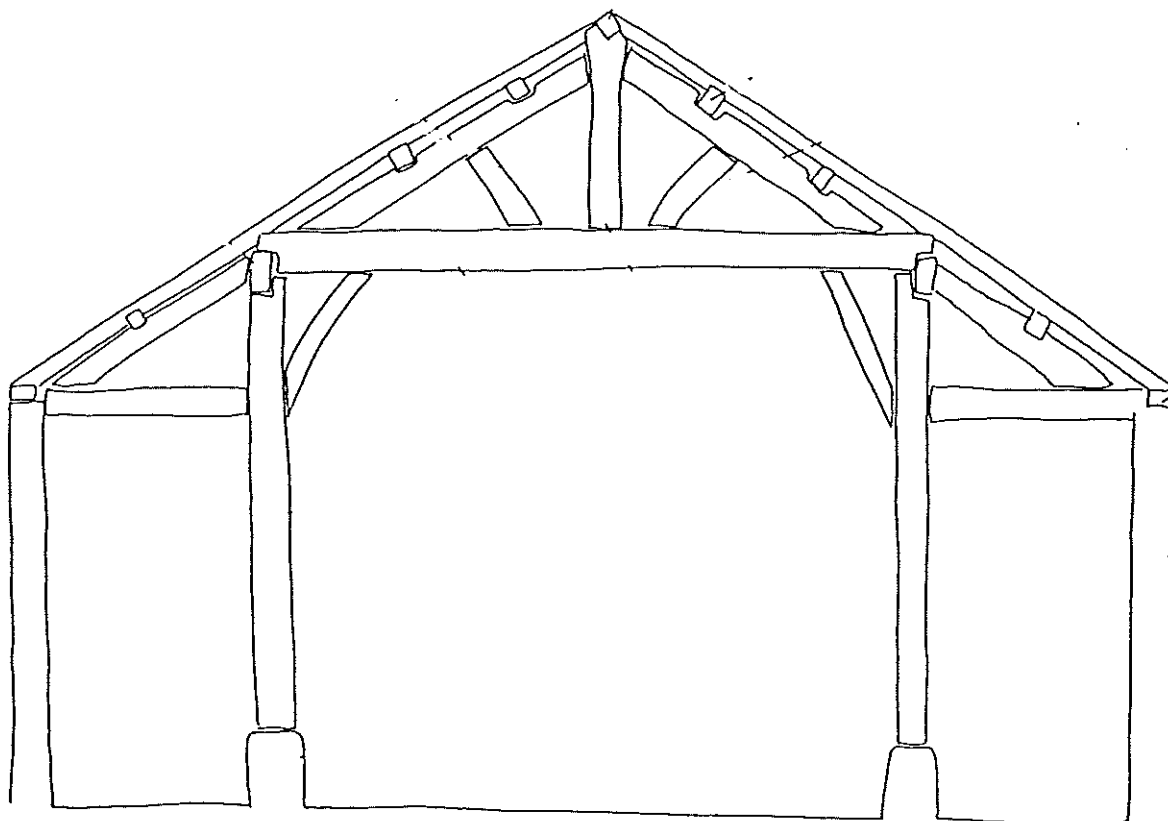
Plan of the trusses in the aisled barn to show sample locations
